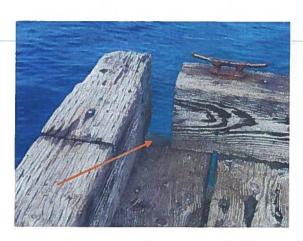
Location of the missing light on the southwest corner of the pier. View of the base of the missing light post.
